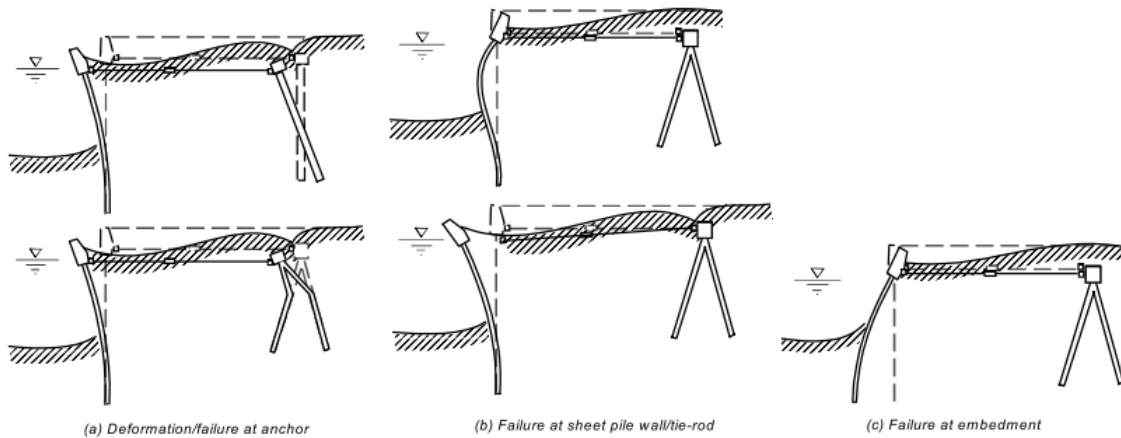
Typical modes of failure for anchored sheet piles (from (PIANC 2001))
